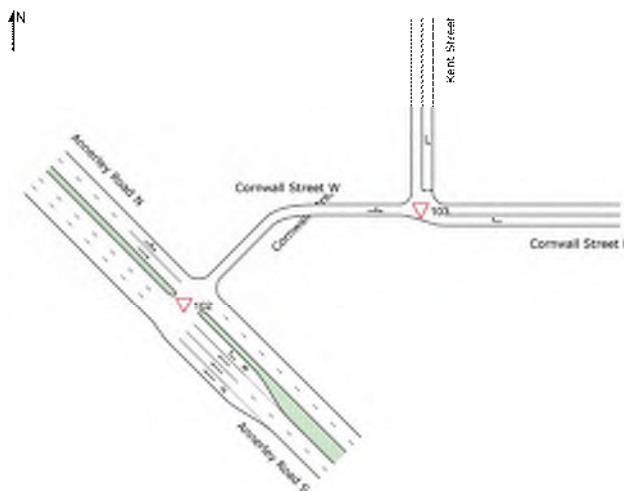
Cornwall Street / Kent Street– SIDRA Geometric Layout
